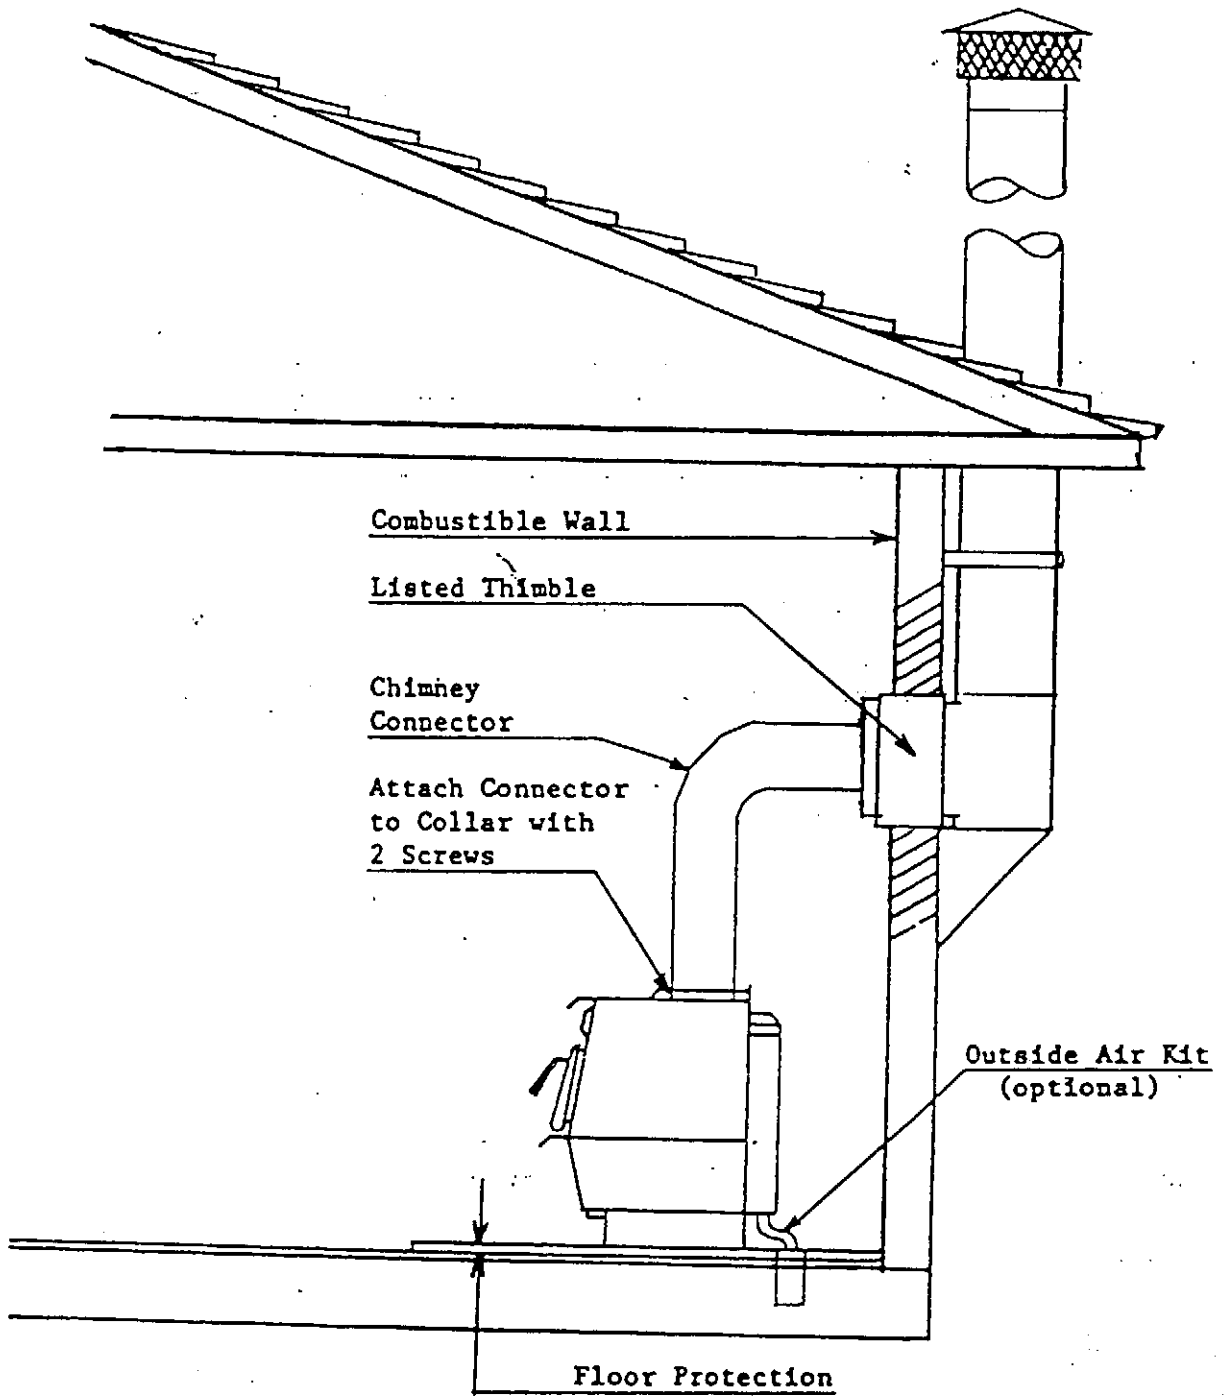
Residential Installation, with Prefabricated Chimney outside a combustable wall.
